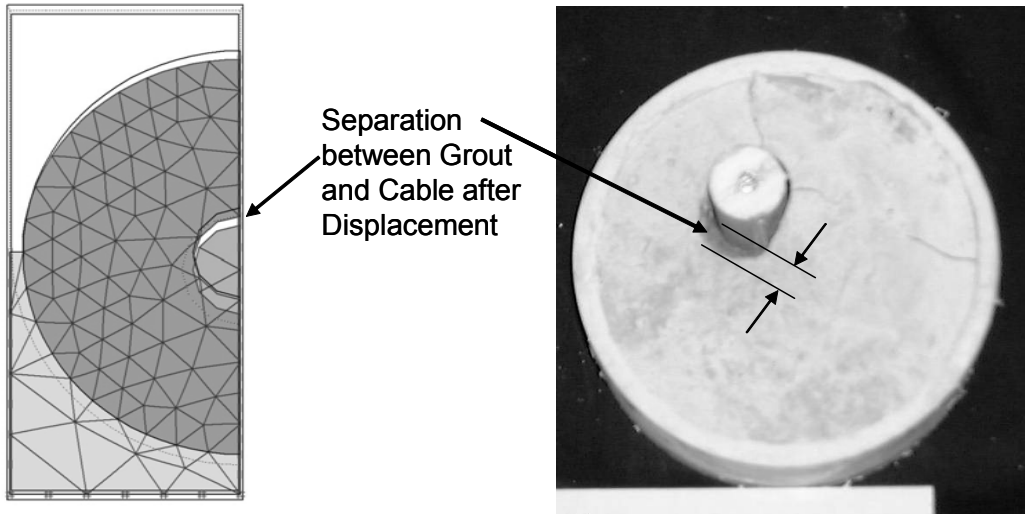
Modeled and observed separation between grout and cable after shear test. The actual cable-grout composite is shown with PVC pipe membrane, which is not modeled.
